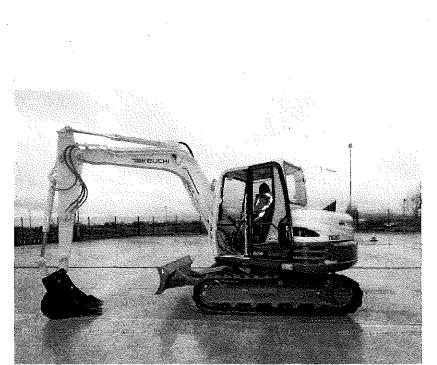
Photograph of a Takeuchi TB175 Excavator to be used on site
